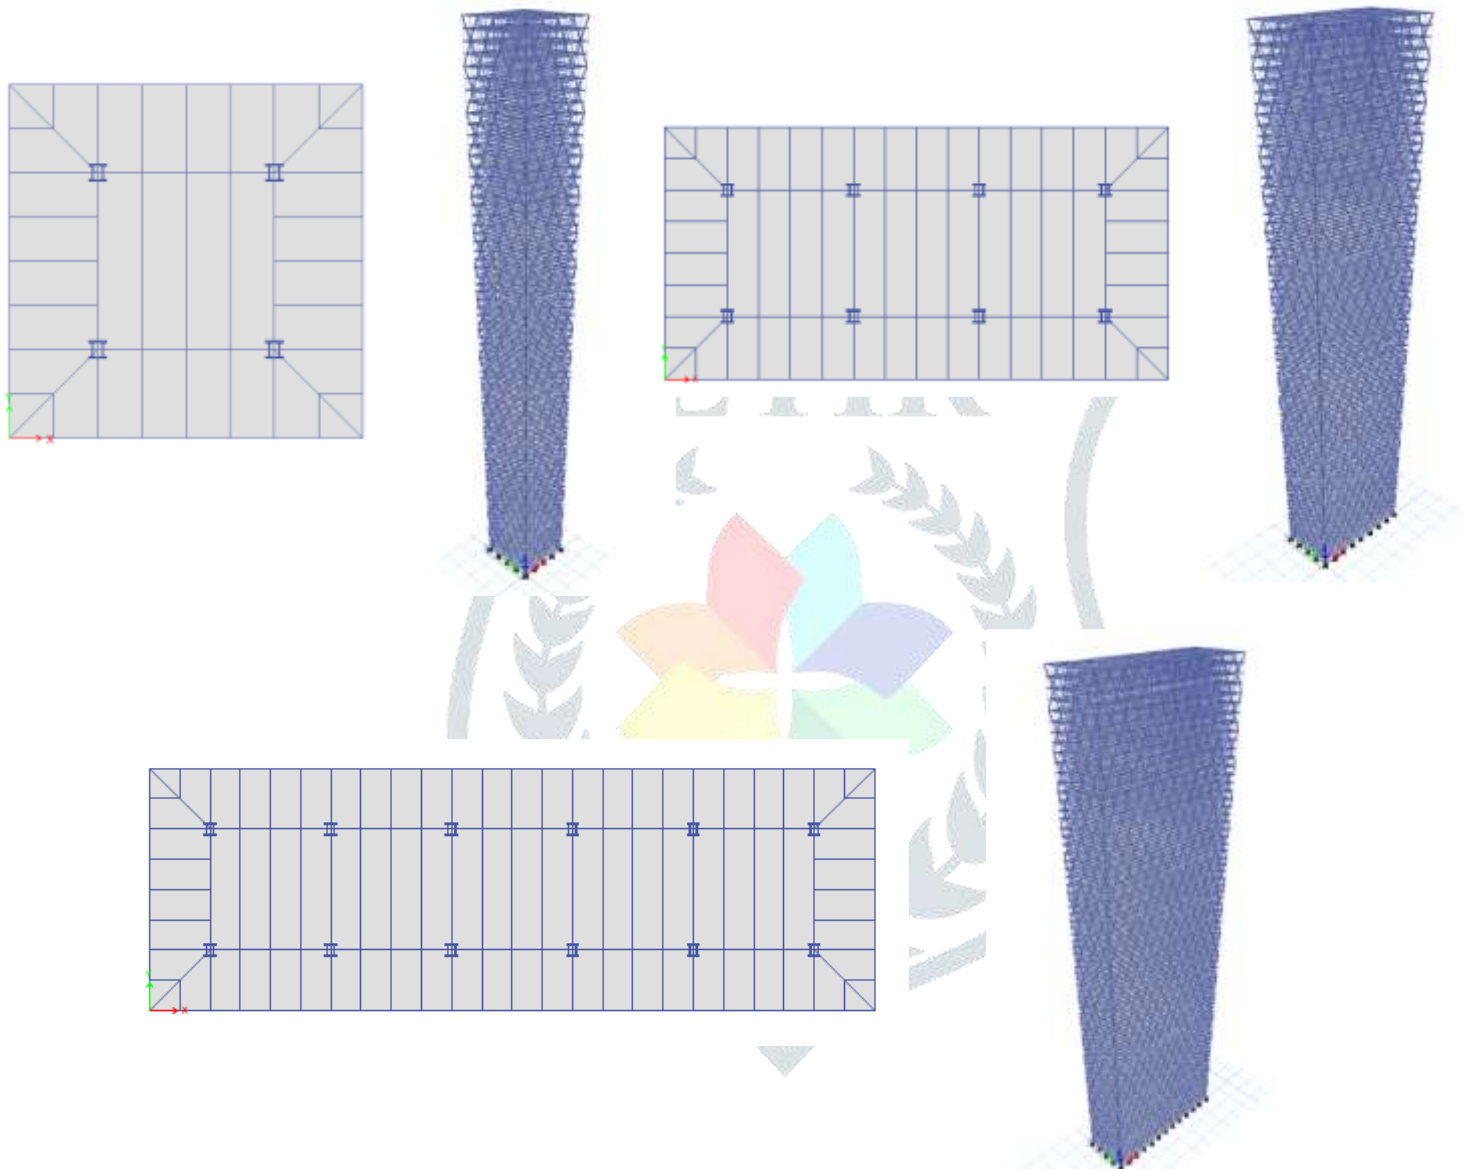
RECTANGLE GEOMETRY 2 & 3D VIEW OF STRUCTURE
